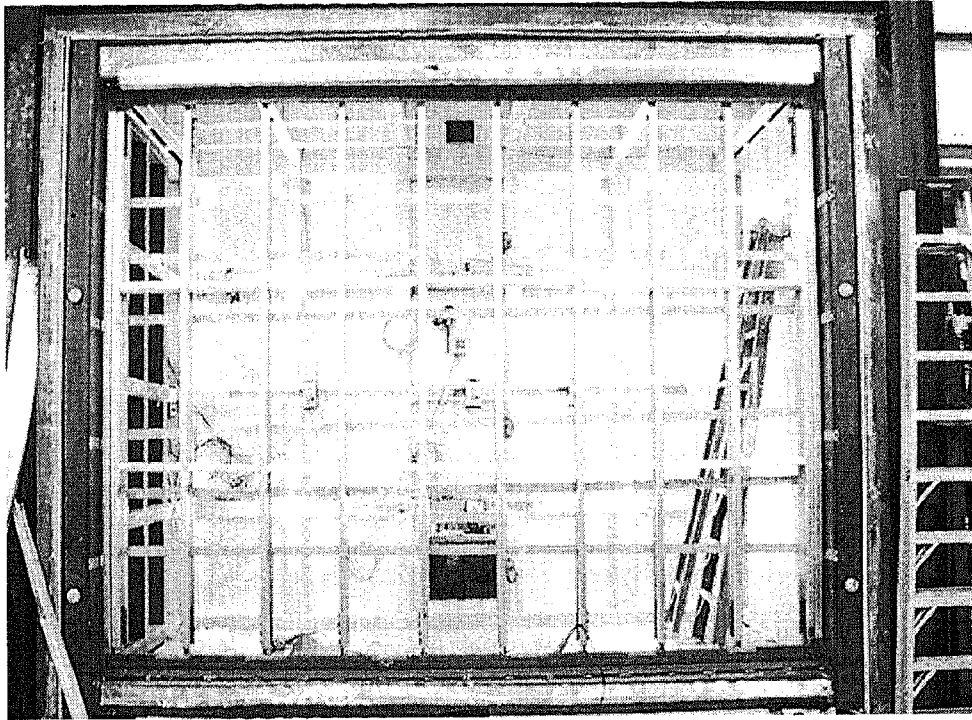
Typical Steel Stud Wall in the Vacuum Chamber
